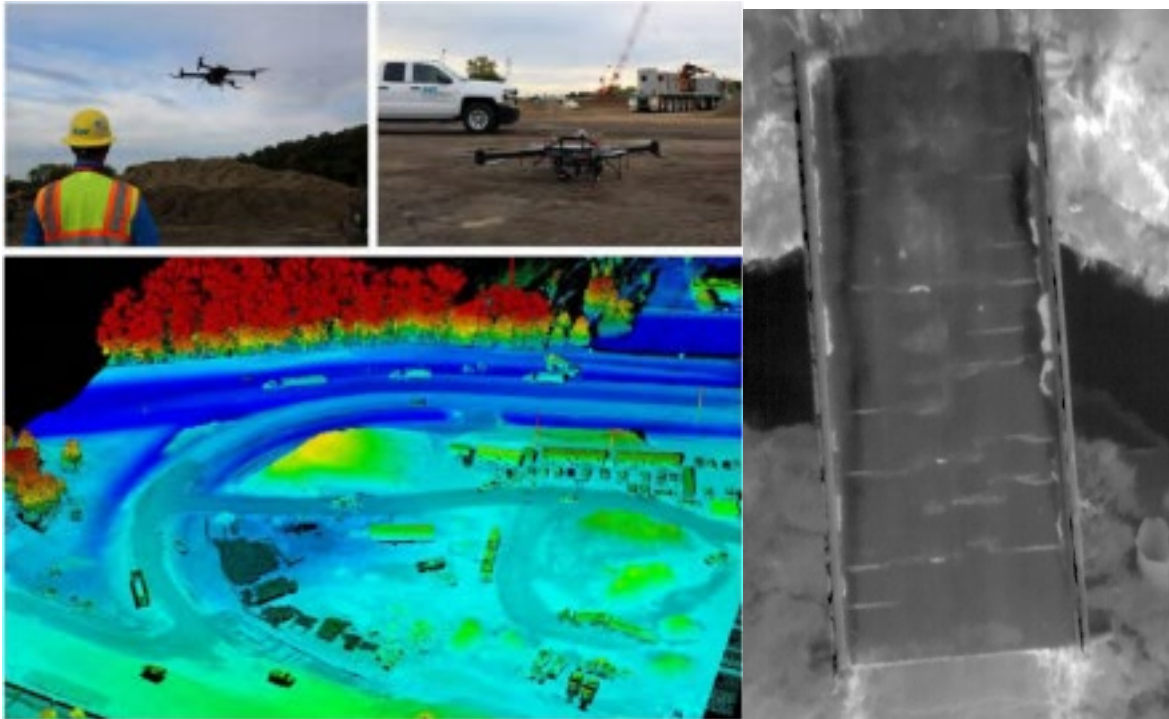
Images of sUAS with LiDAR to Provide a 3D Model of the Construction Site and Thermal Imaging System for Bridge Condition Inspection (Brooks et al., 2018)
